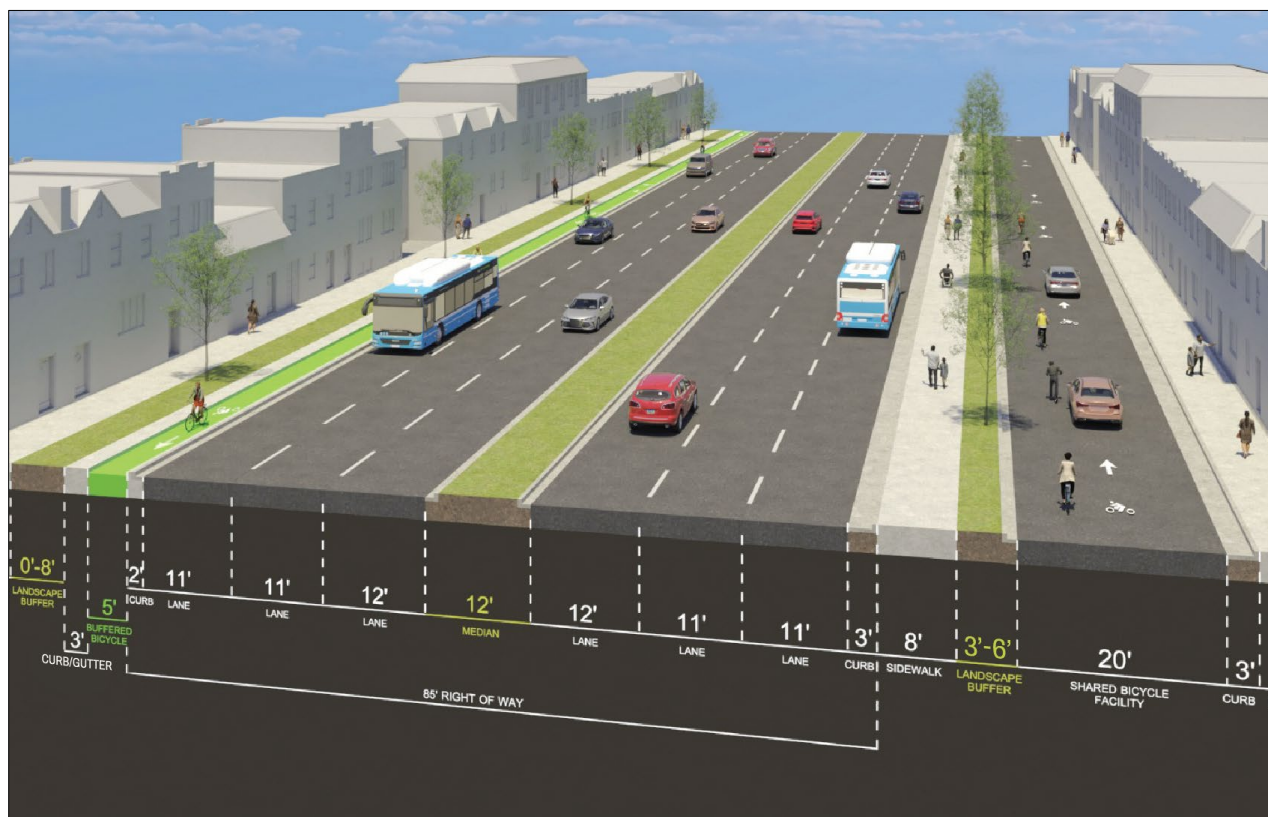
Re-Imagine North Watt Corridor Plan, Typical Watt Avenue with Frontage Road Cross-Section
